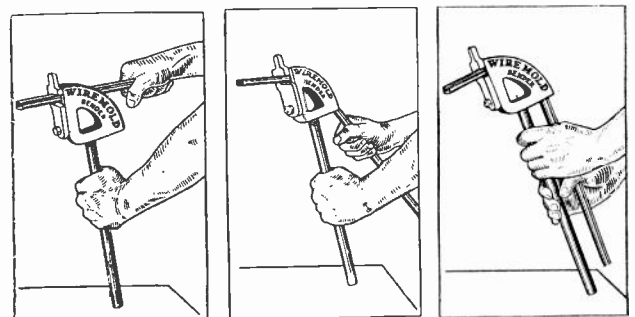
This view shows a bending tool, and the method in which metal molding can be bent into different shapes for turns and corners.
